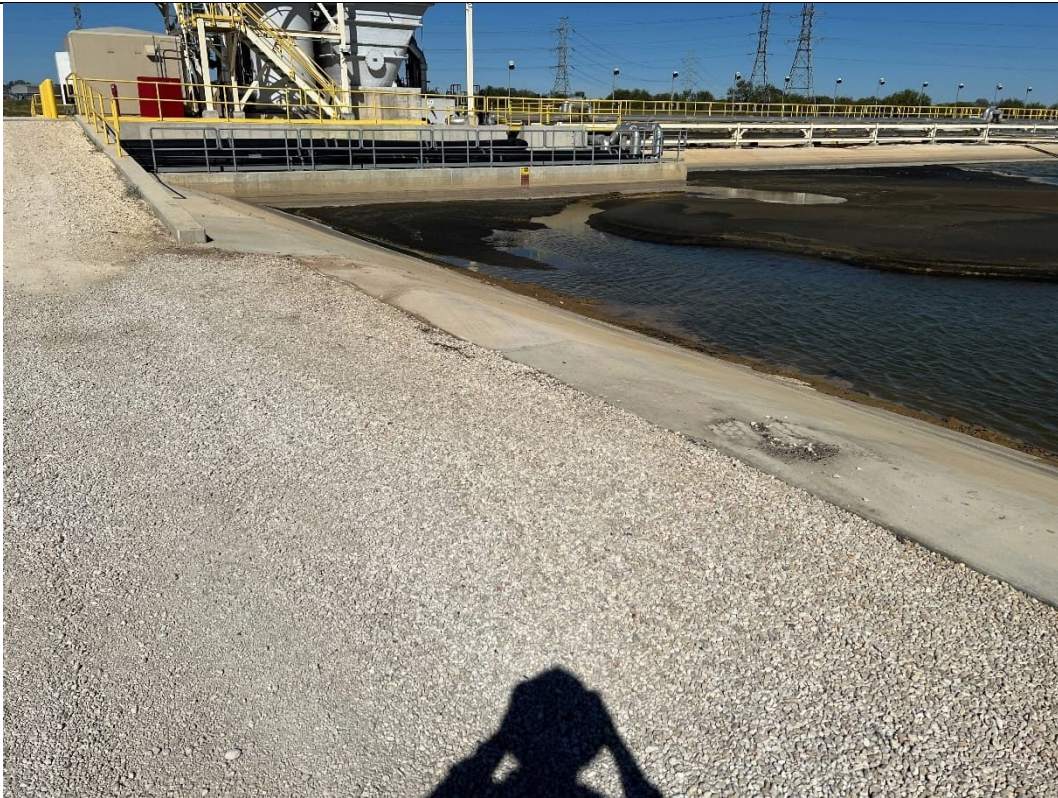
| West Plant Drains Pond – standing on the southwest corner – facing east.
